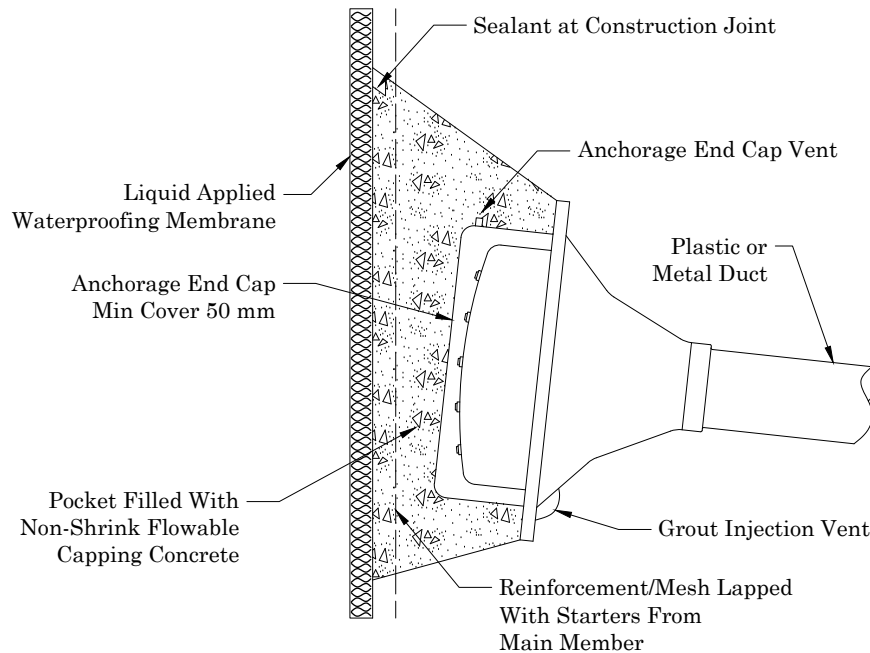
Anchor head protected with different layers in prestressed concrete slabs adapted from ACI 222.2R-01 (2014) with permission.
